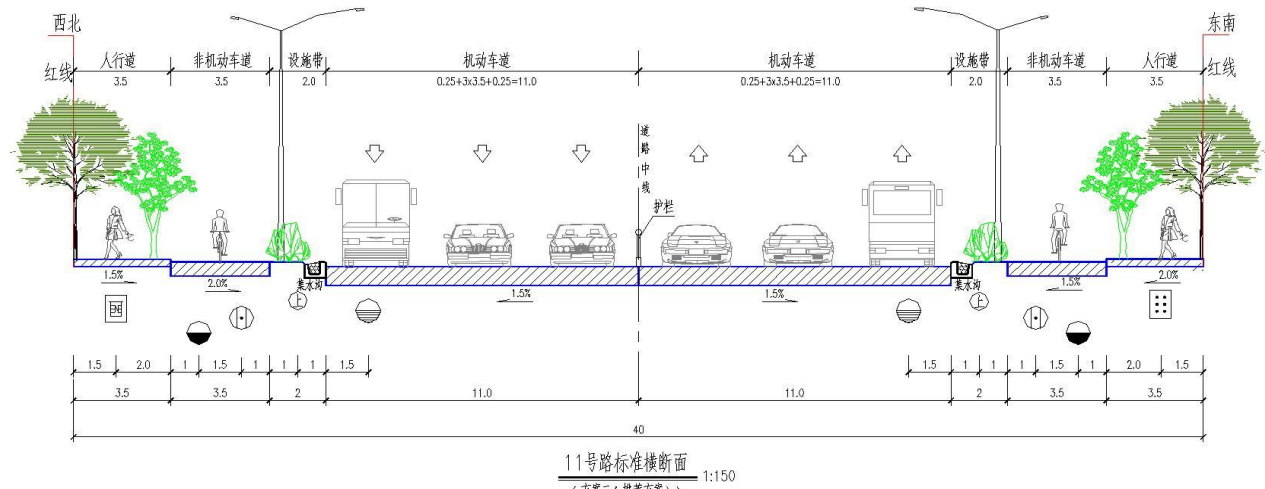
Cross-sections of No. 11 Road in Chuxiong
